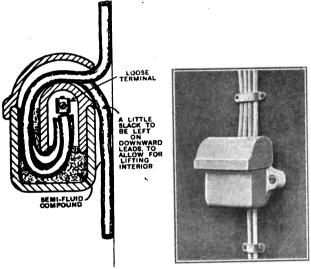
Section. Fig. 5.—Box in Position. Wall-type Junction Box.
